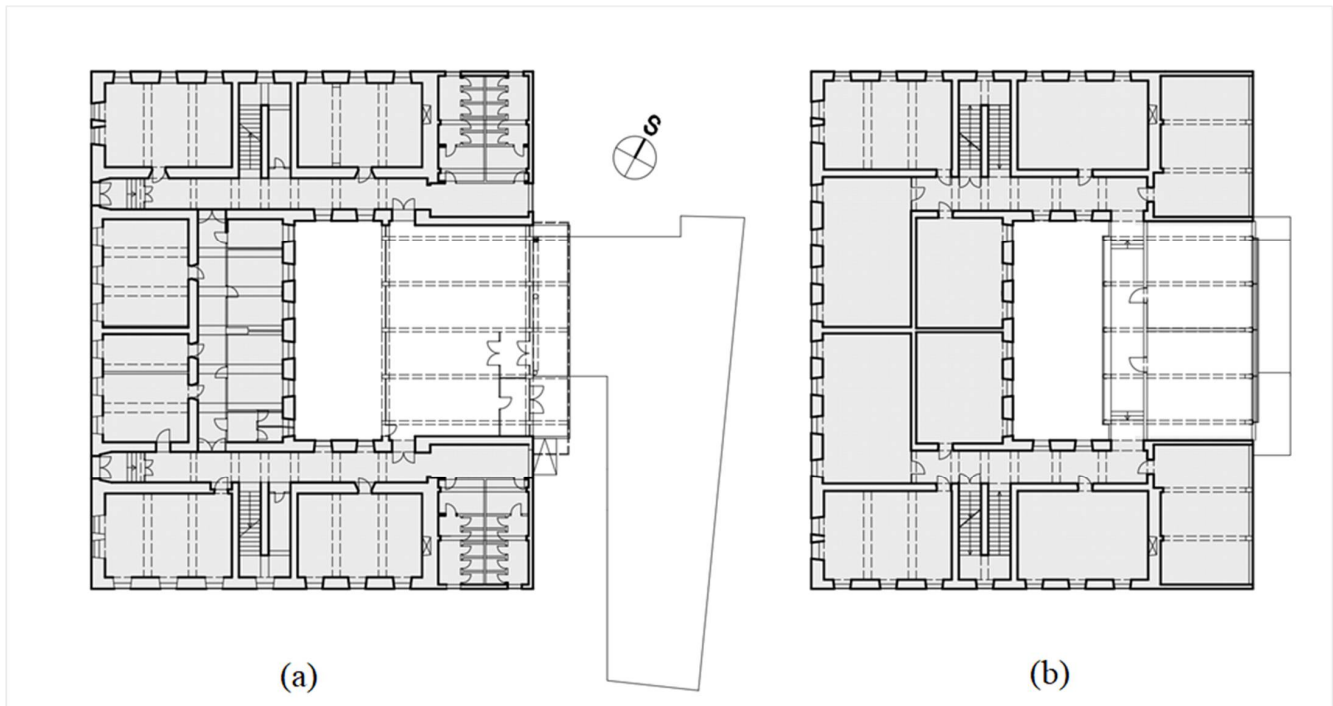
Floor plans: (a) ground floor; (b) first floor.
